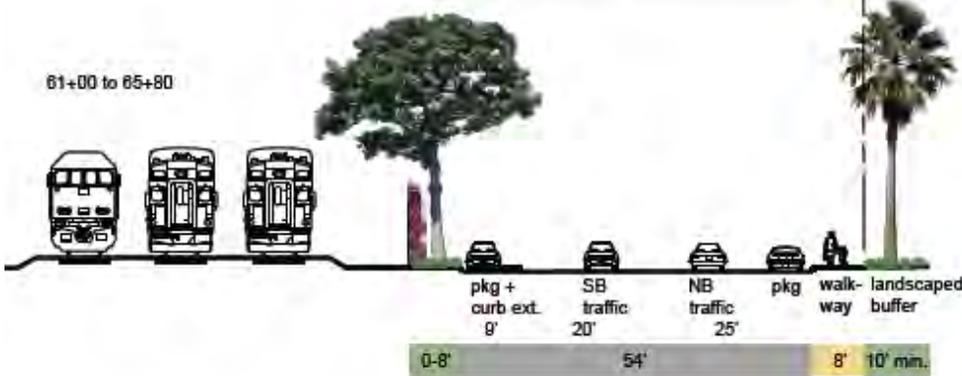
B Camino Capistrano Cross Sections—Looking North
